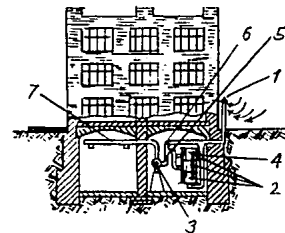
Plan of the Filter-Ventilating System in a Cellar Shelter. 1 - air-intake pipe; 2 - filter; 3 - ventilator; 4 - valve a; 5 - valve b; 6 - valve c; 7 - pipes conducting purified air into shelter.
